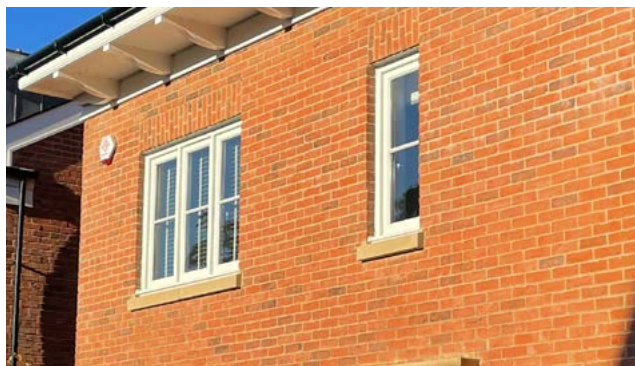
Arched brick lintel with a stone sill string. Windows have timber glazing bars
